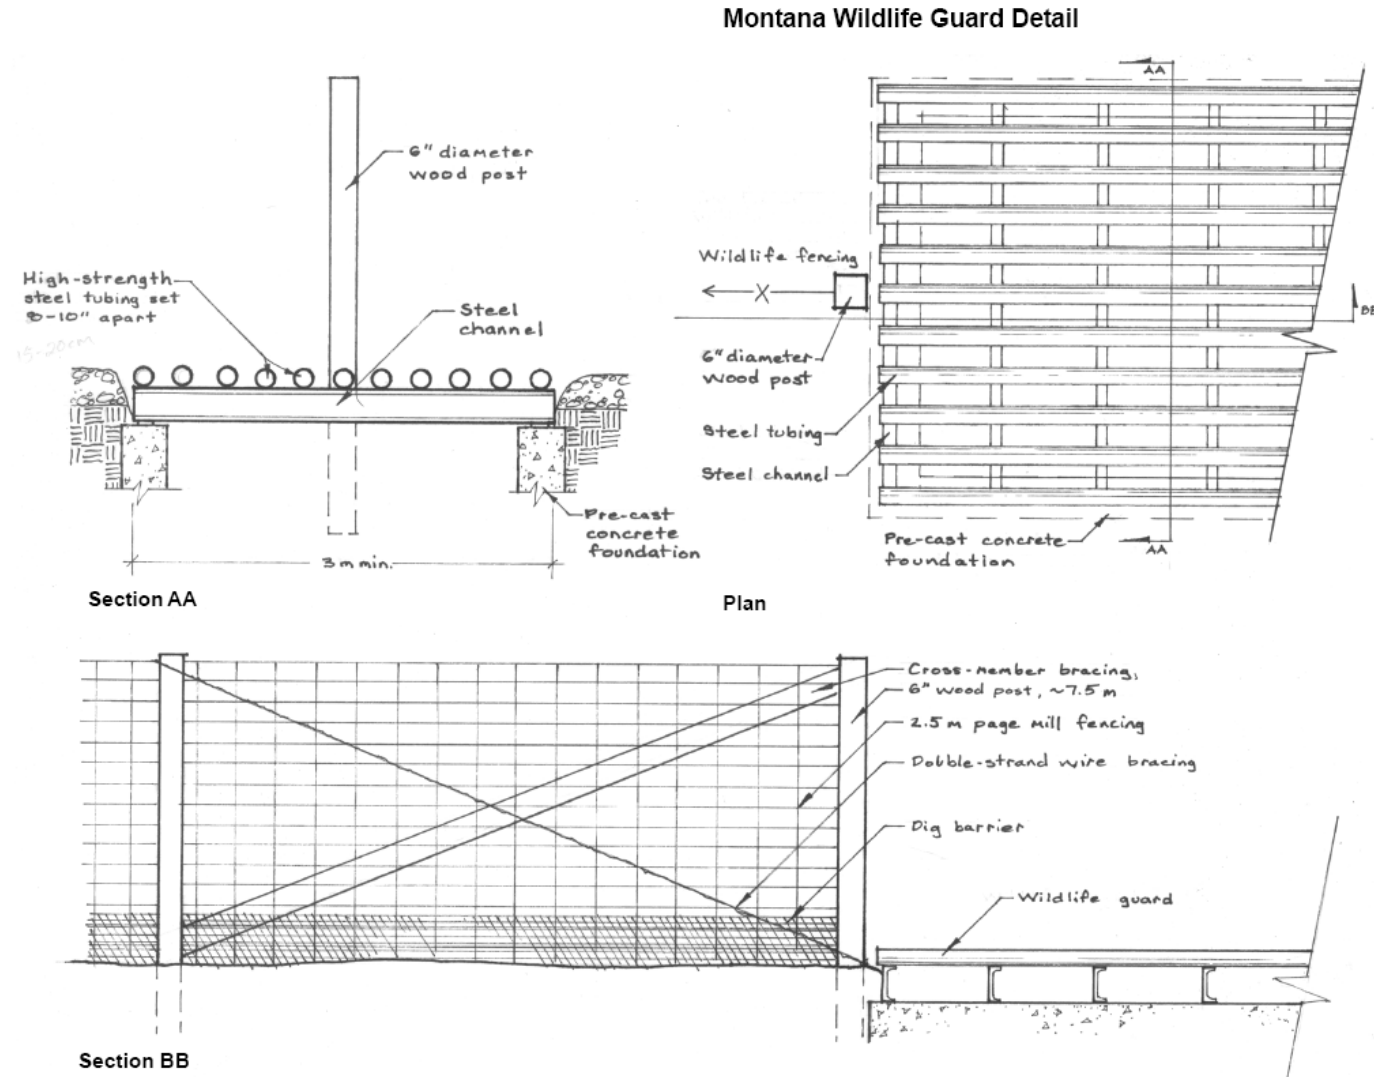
Fencing placement and wildlife guard typical details provided to US 93 design consultants (Jones and Jones 2002b)
